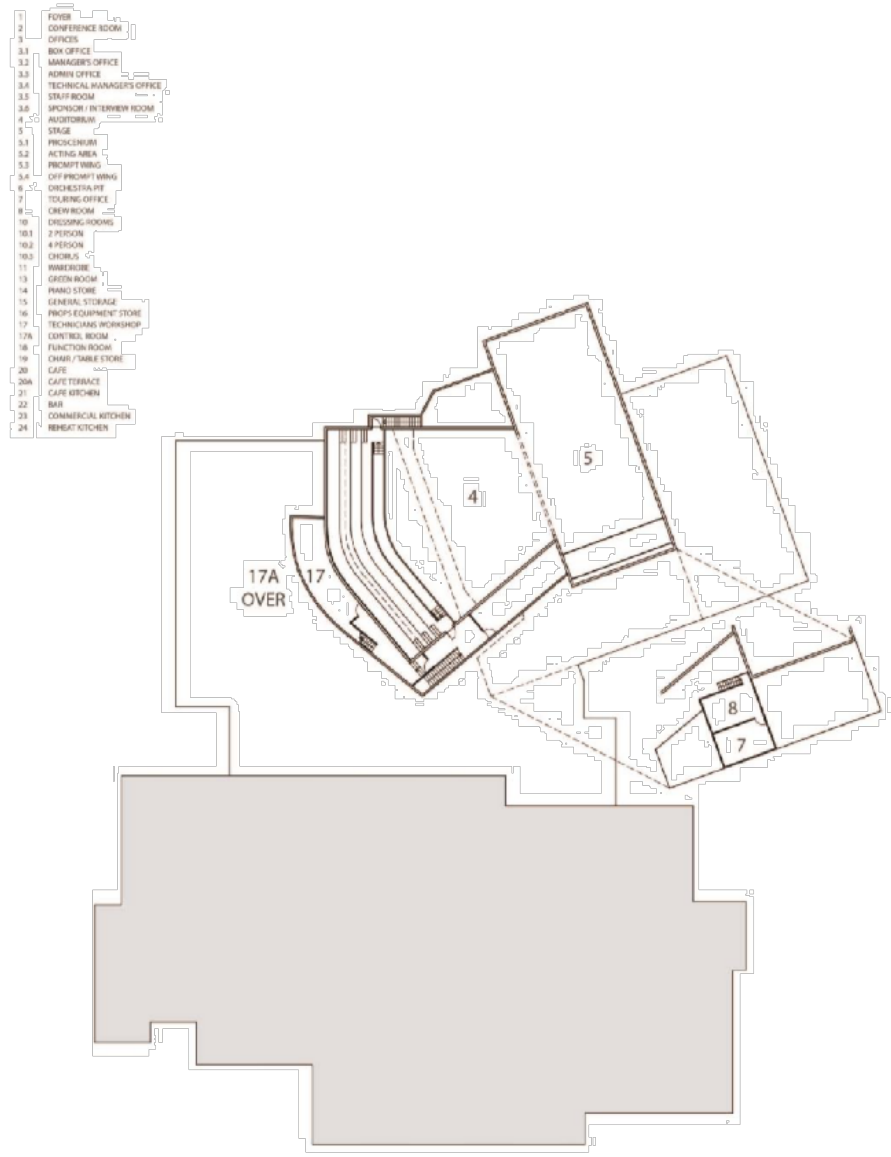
Morwell Floorplan (1<sup>st</sup> Floor)
